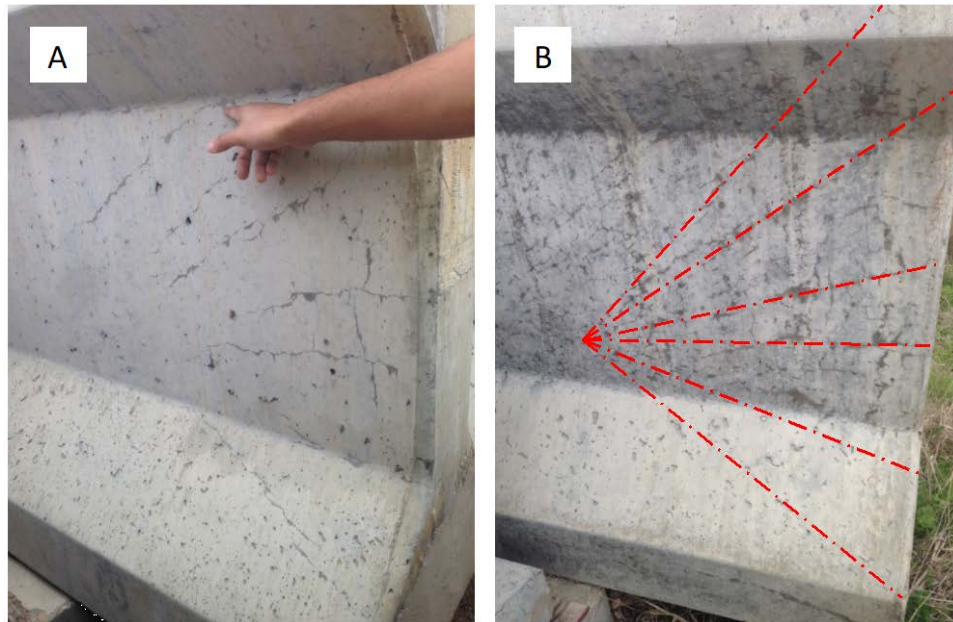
(A) Photo of girder located at Precast Plant PP-B with fingers pointing to diagonal release strand cracks. (B) Photo of a separate girder located at Precast Plant PP-B showing that the micro-cracks stem away from the release strand cracks and form in new space between release strand cracks
